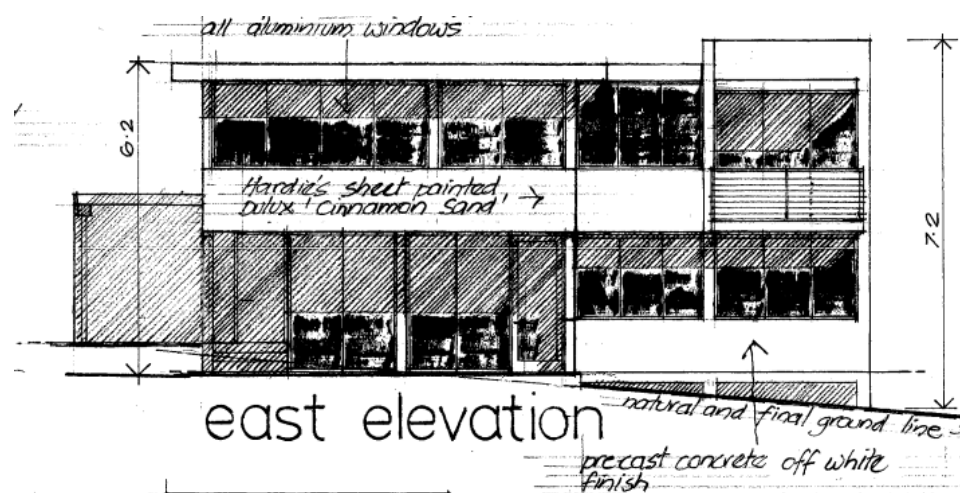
The proposal from the eastern elevation (facing Channel Highway)
